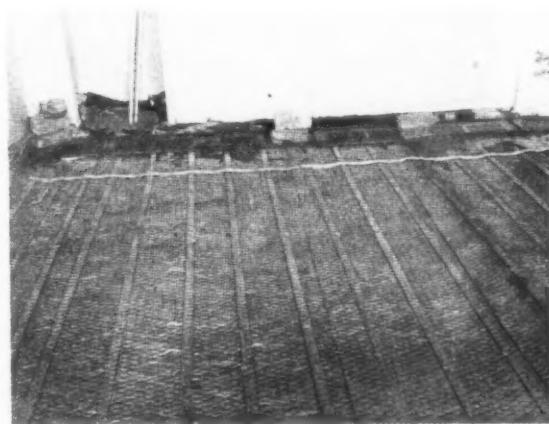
Floor heating equipment just before laying of top concrete screed.
